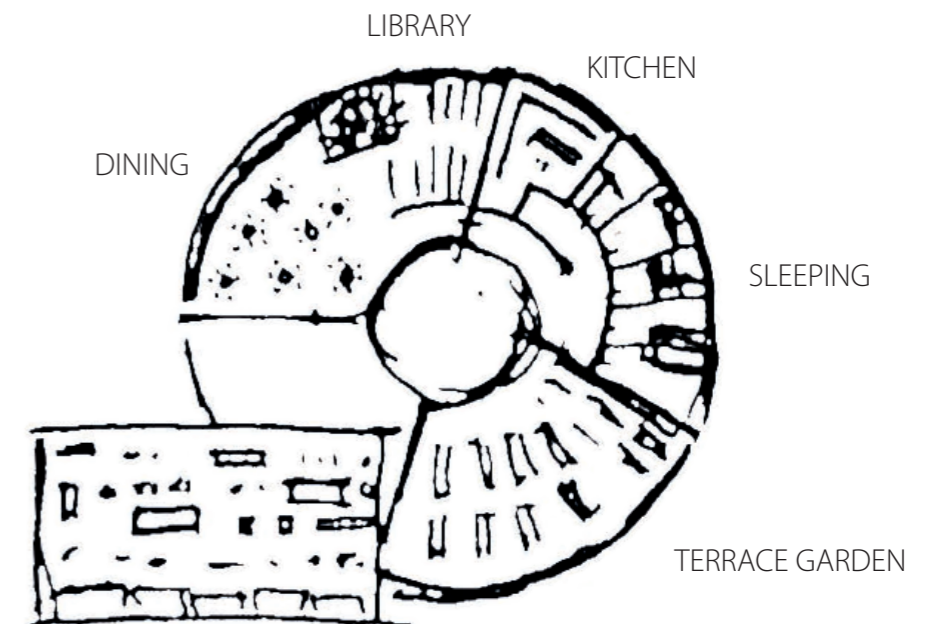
This plan diagram exemplifies how a floor plan could be divided, with small private bedrooms and a shared kitchen, dining space, terrace, and library.
